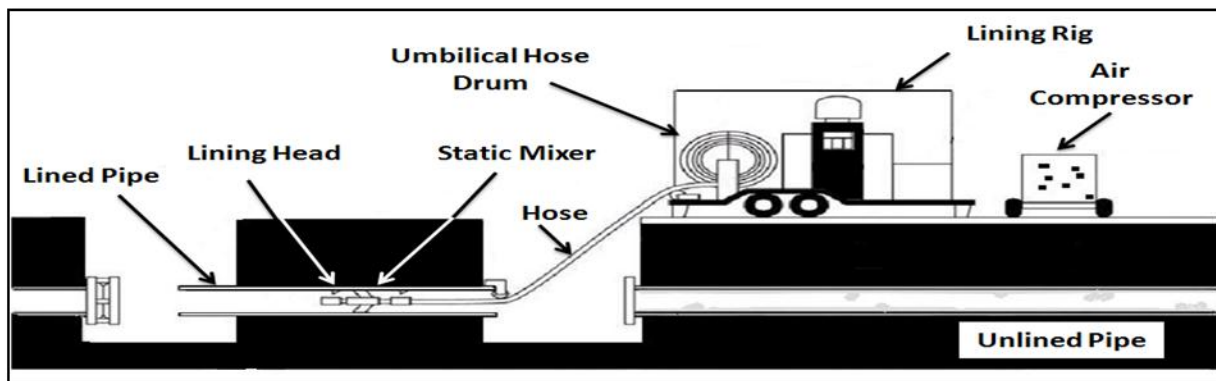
General Site Layout for Spray-in-place Pipe (Source: 3M Water Infrastructure)
